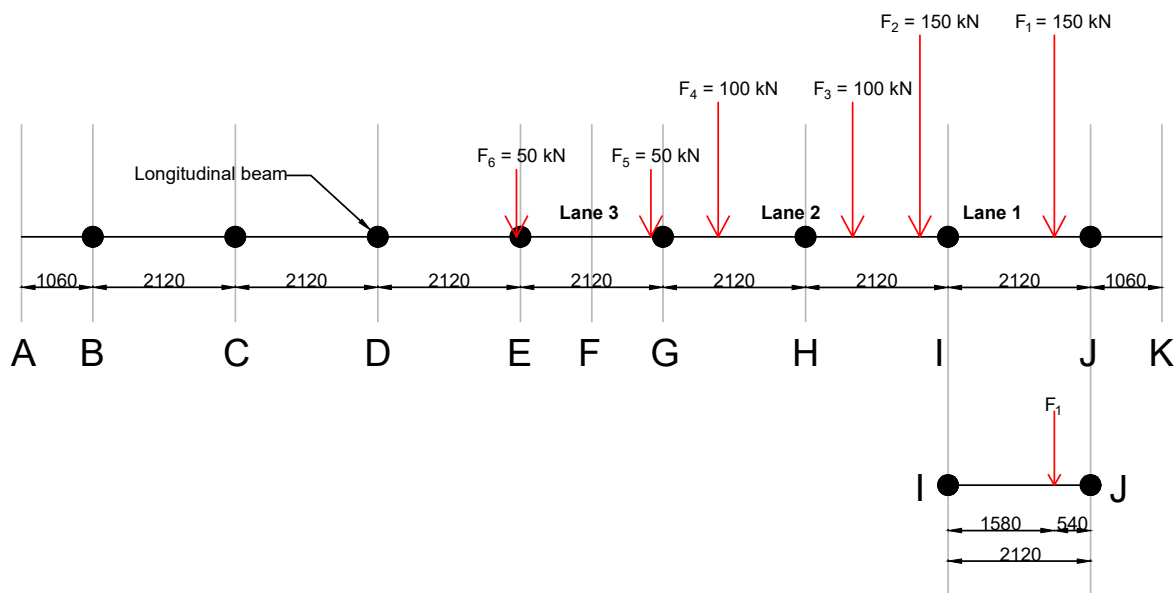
Transverse cross-section: position of the tandem loads and the longitudinal beams of the grillage model (mm)
